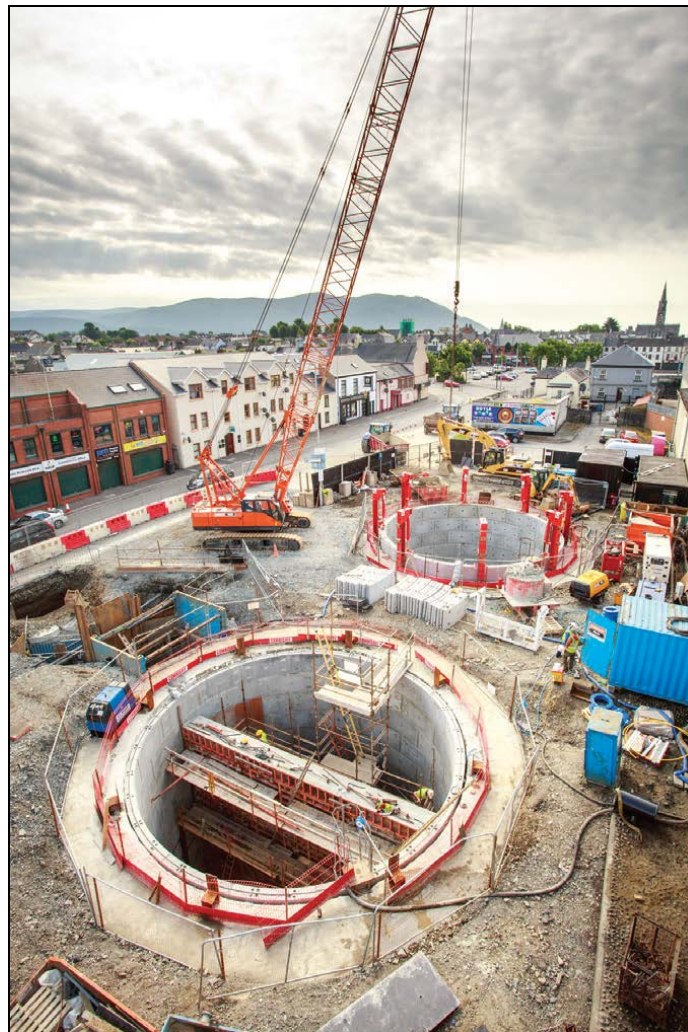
Newry Street, Warrenpoint pumping station upgrade 2014
